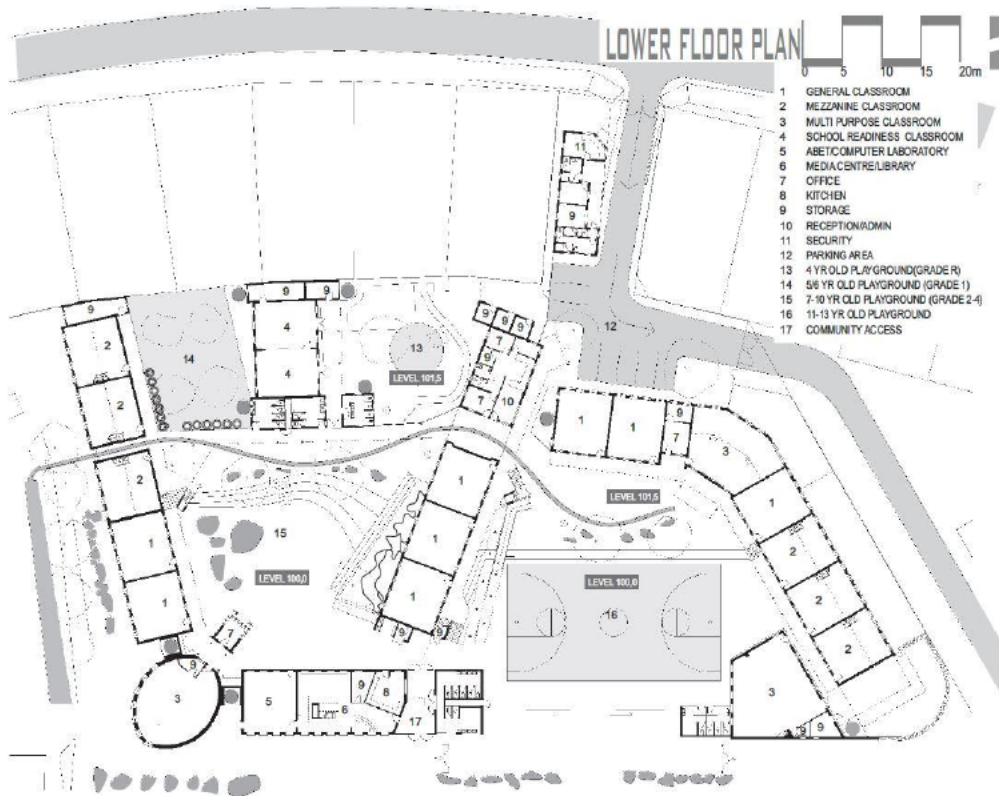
Ground Floor plan of Seven Fountains School, Source: <https://www.eastcoastarchitects.co.za>
